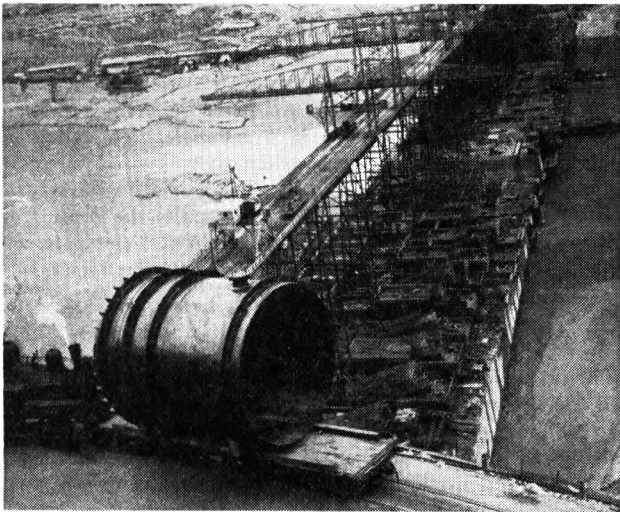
RAILROAD TRANSPORT OF MAIN-UNIT PENSTOCK SECTION
